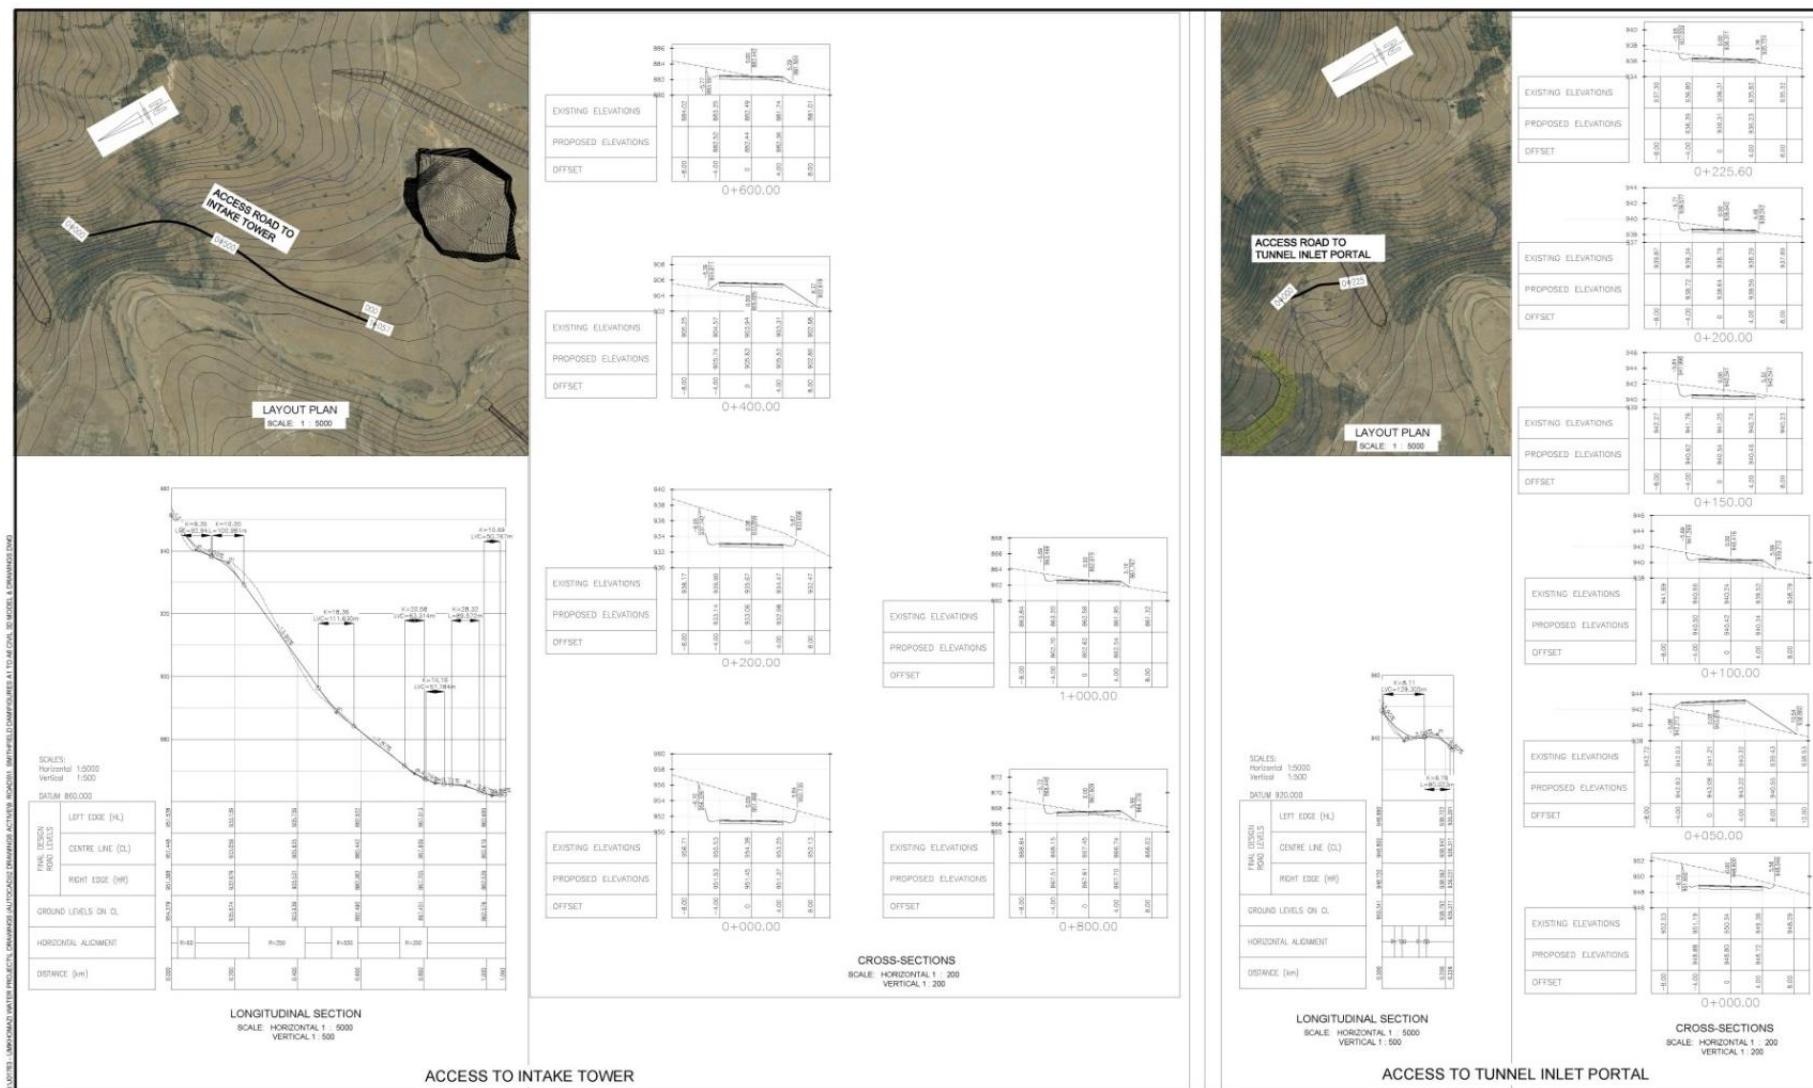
C.9: Smithfield Dam – Layout plan, longitudinal sections and cross sections of access road to intake tower and tunnel inlet portal
